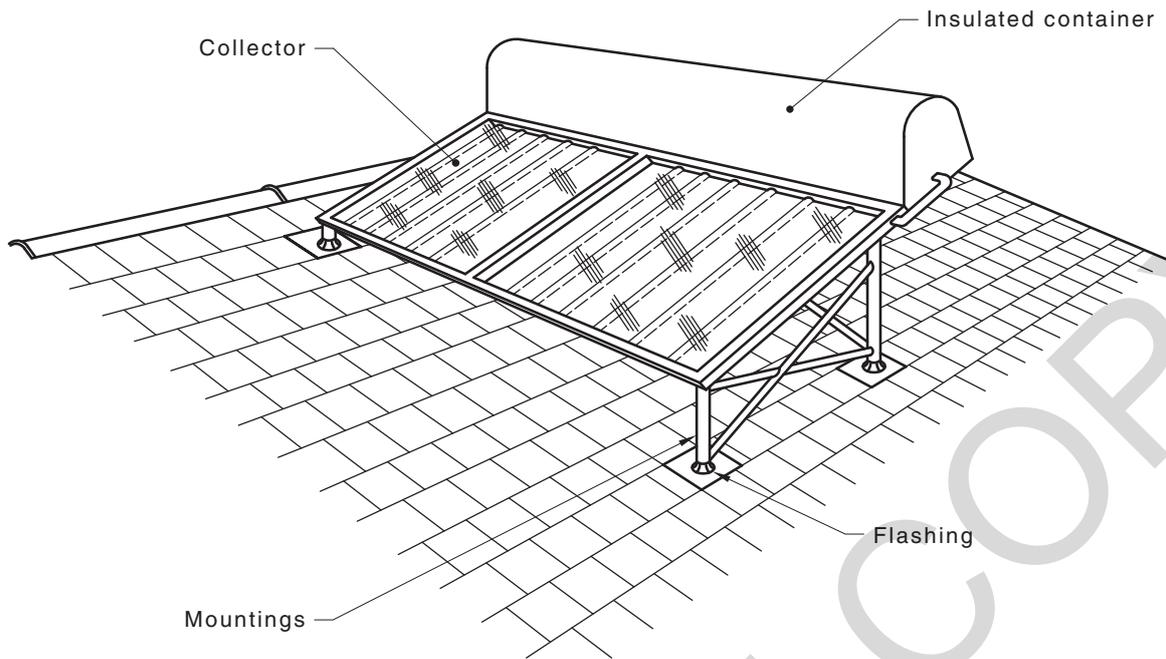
F2.3 CROSS-PITCH INSTALLATION
